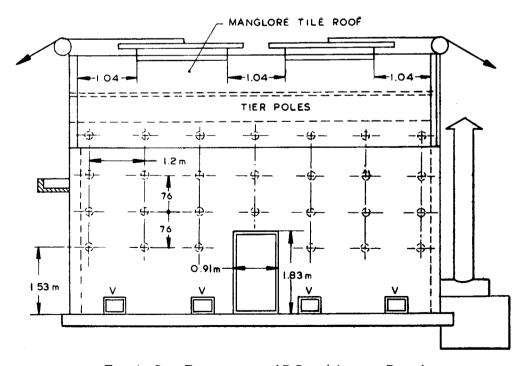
Side Elevation on AB Side (Andhra Barn)
